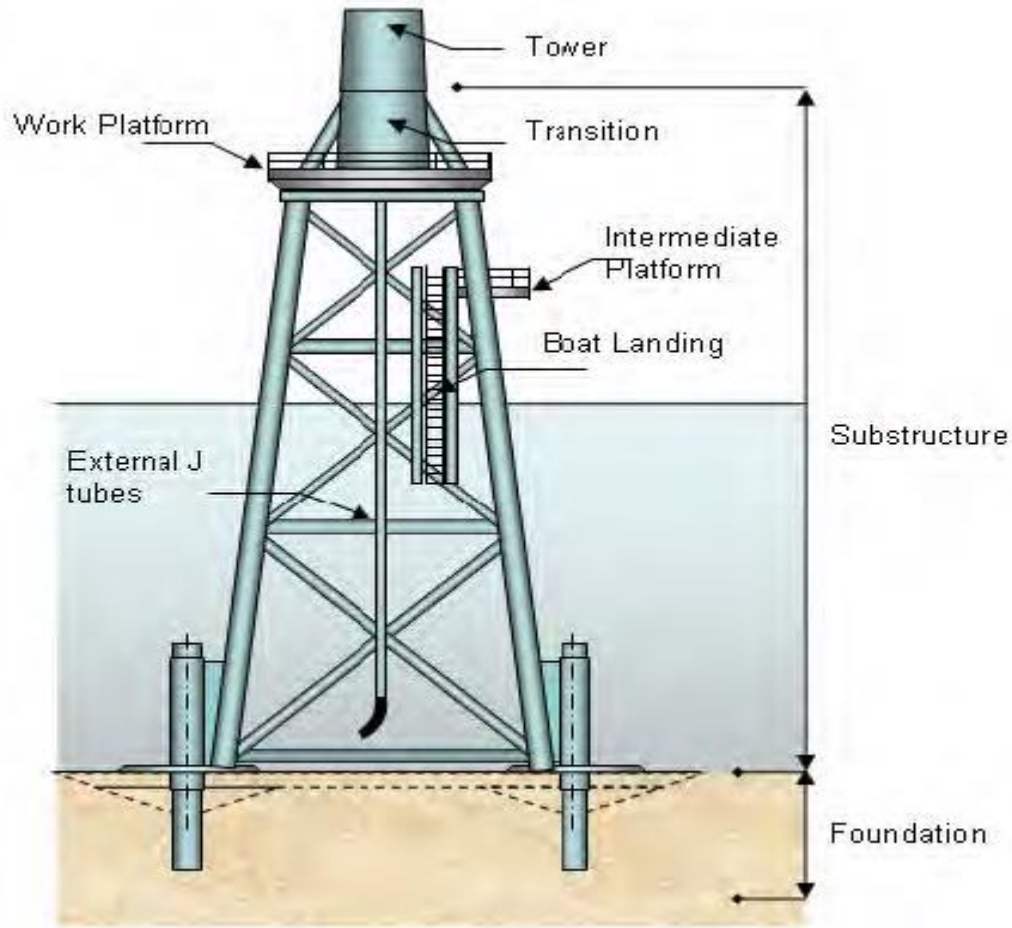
Components of a Jacket Foundation (EWEA, 2009)
